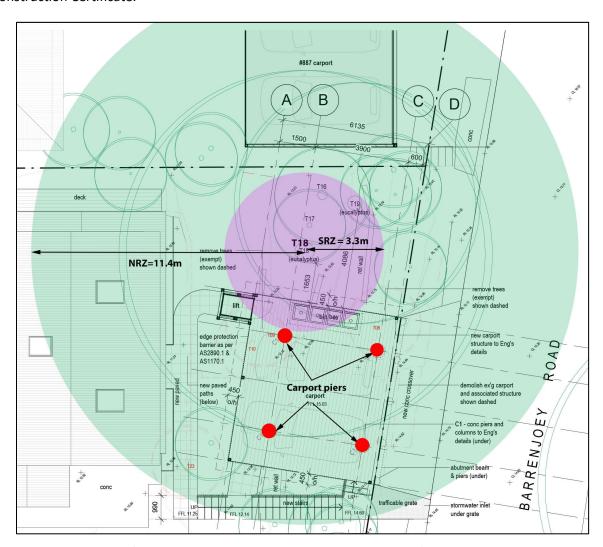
Figure A: Excerpt from the Carport Plan showing the Root Zones of T18.
